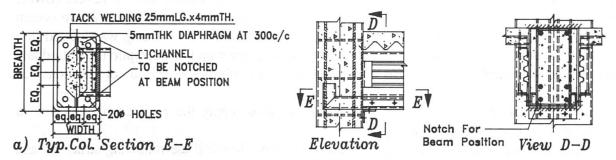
Beam-Column Connection With Concrete Filled Tubular Column
